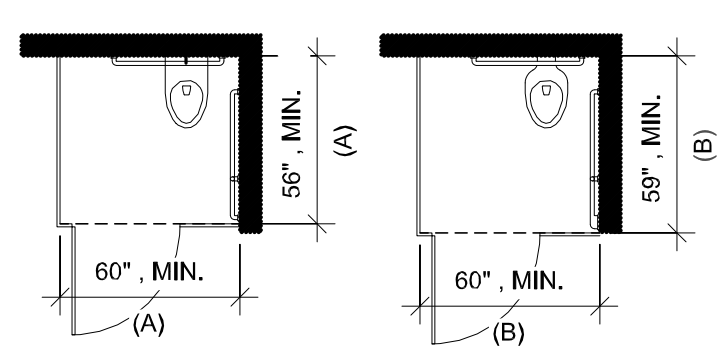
WHEELCHAIR ACCESSIBLE TOILET COMPARTMENTS (A) WALL-HUNG WATER CLOSET (B) FLOOR-MOUNTED WATER CLOSET
